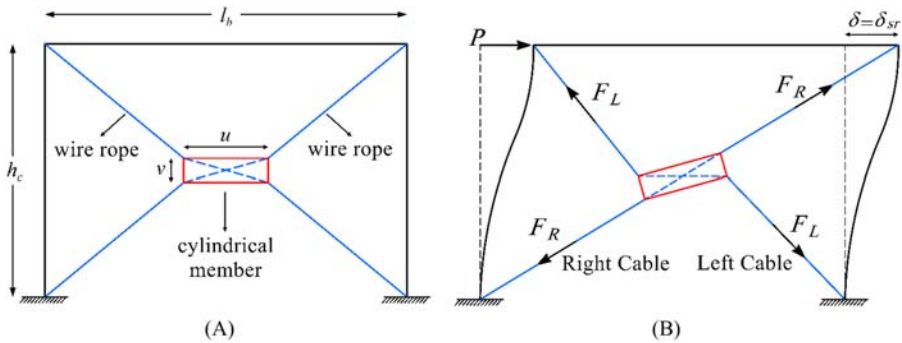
Cable-cylinder bracing system: (A) configuration and (B) deformed shape [26].
